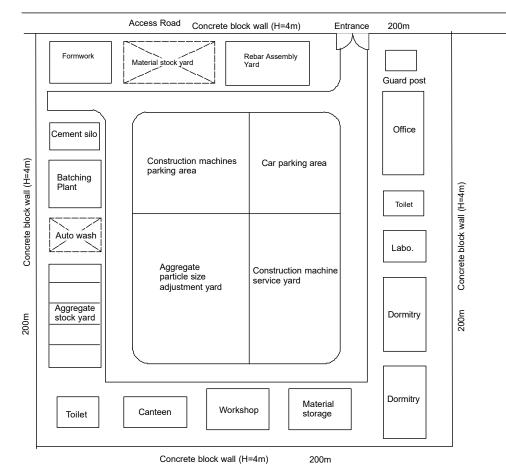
Proposed Typical Main Camp Yard Layout
